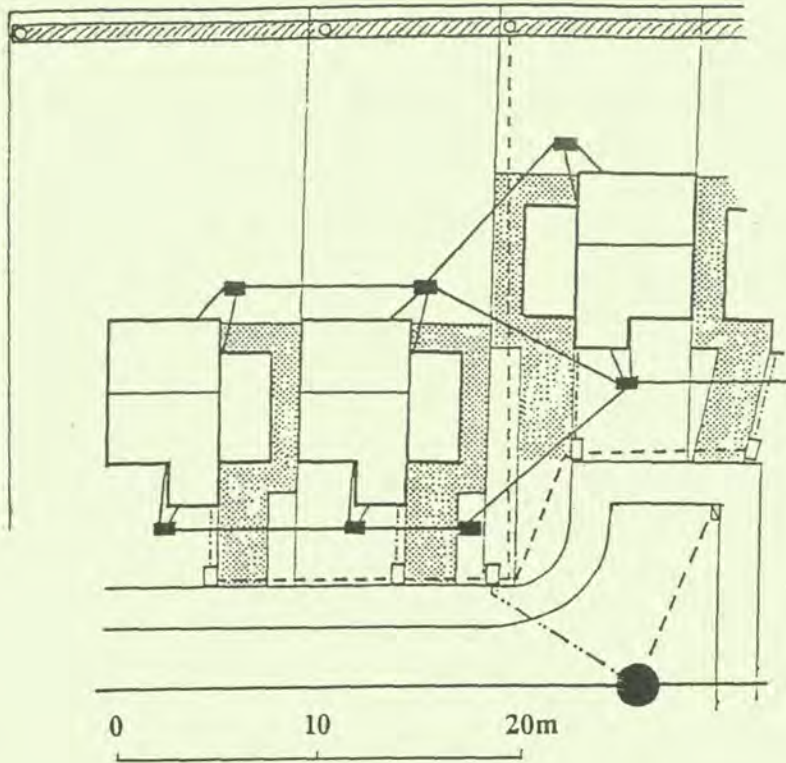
Detail of the possible modified drainage scheme showing local overflow controls on stored water and first disposal to an infiltration trench before overflow to the combined sewer
